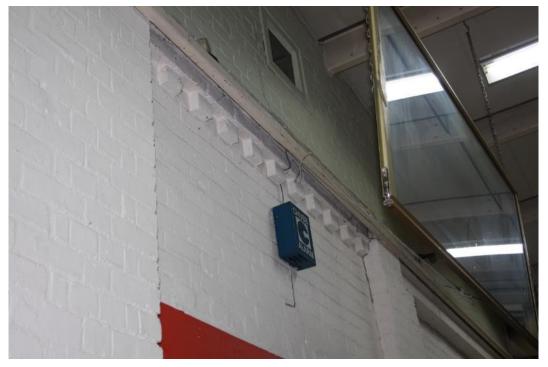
Corbelling over the door leading into Room 4 from Room 3
